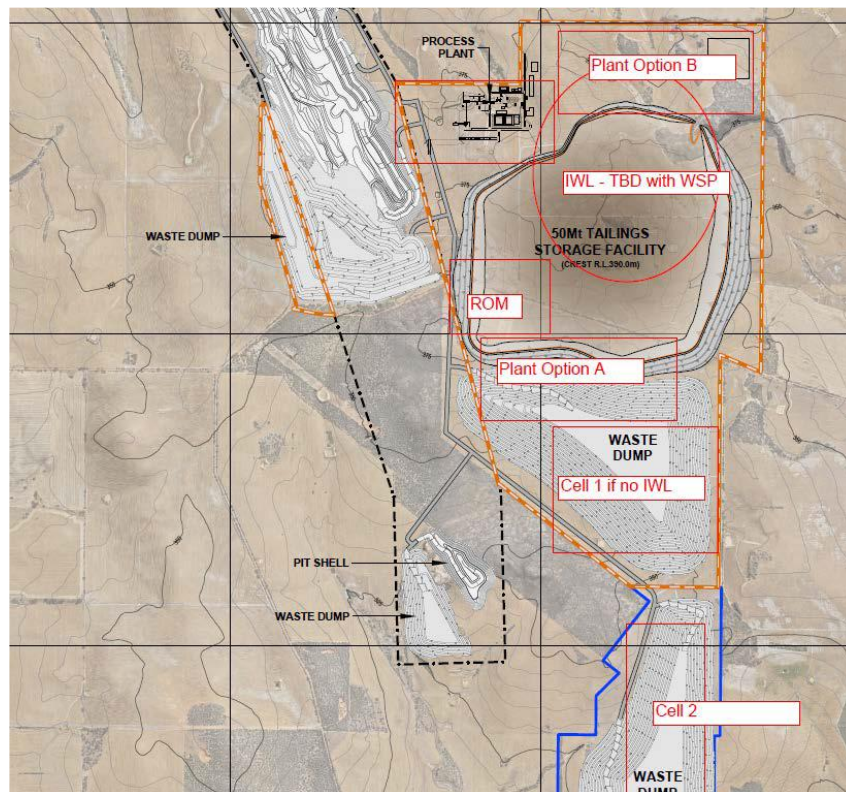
Zoom-in on original DFS concept layout on mining tenure and/or Ausgold land
